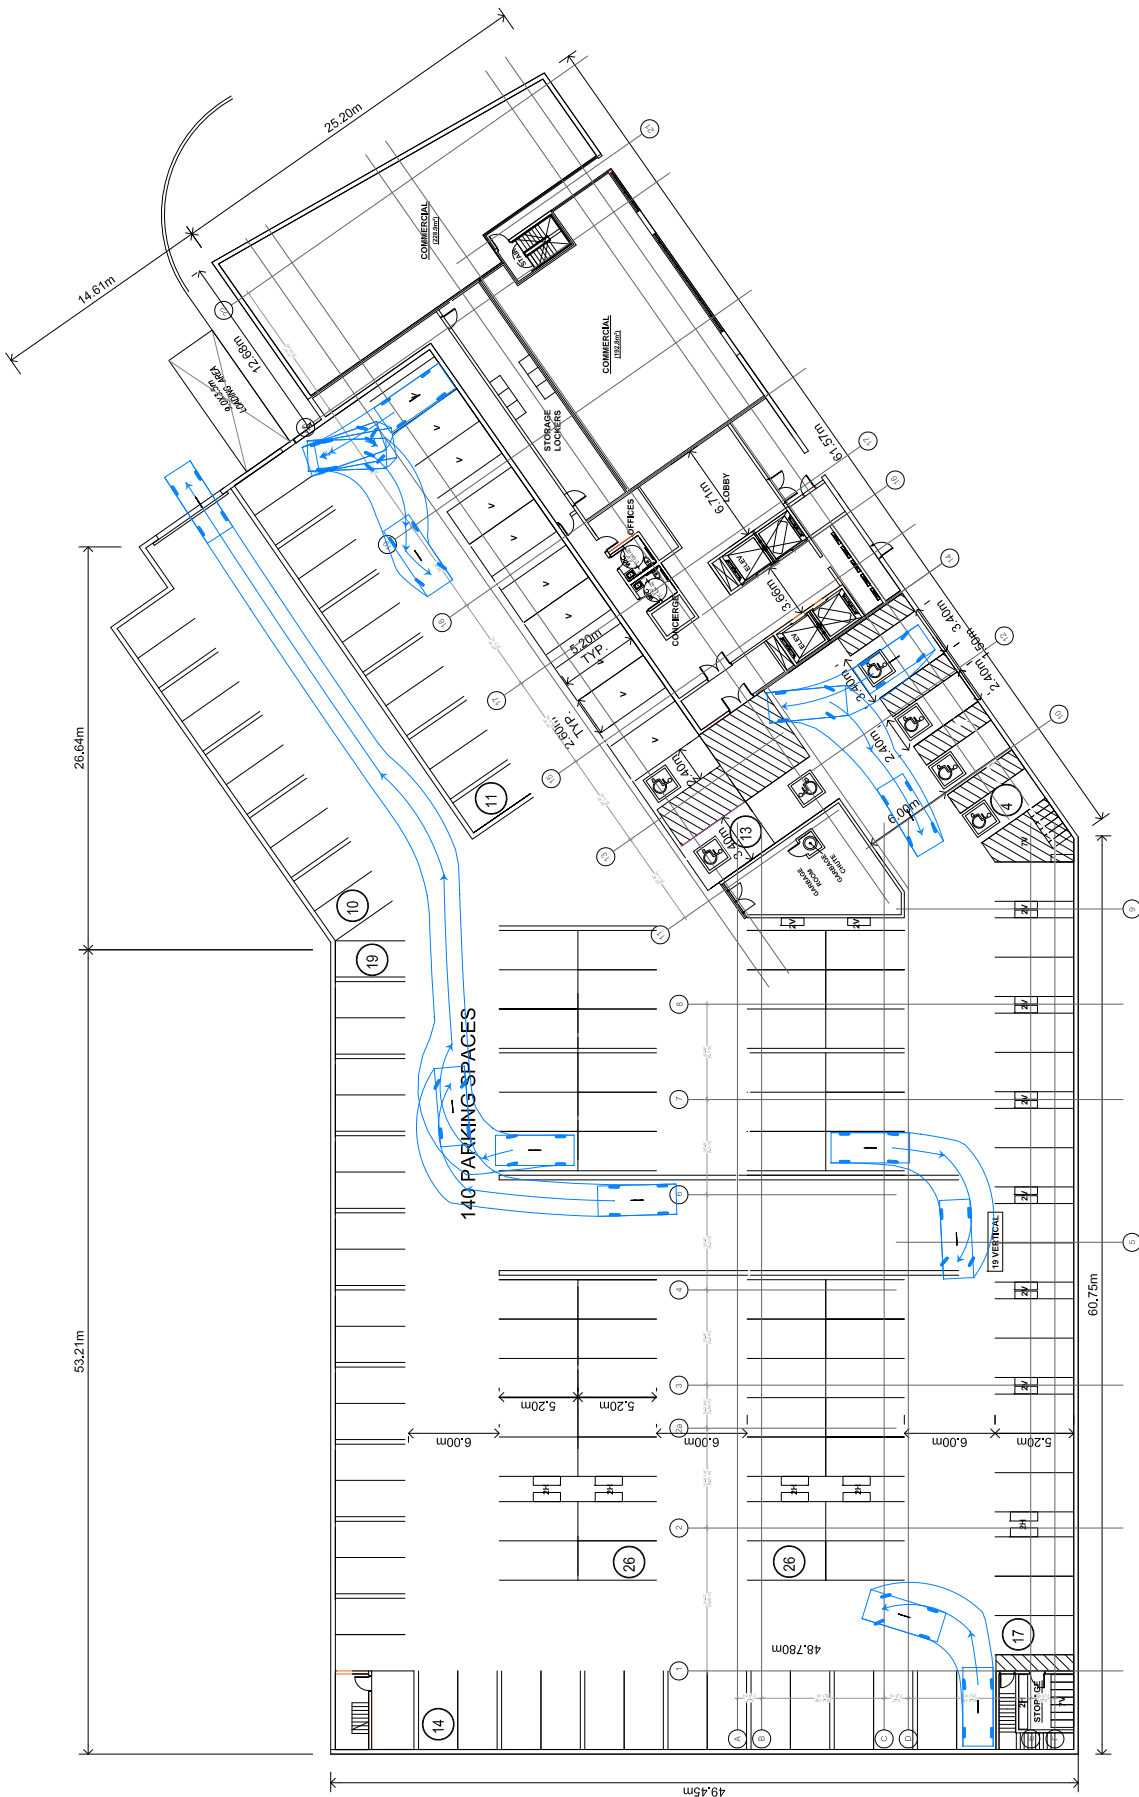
Passenger Vehicle Exiting the Parking Spaces and the Underground Garage (Building C)
